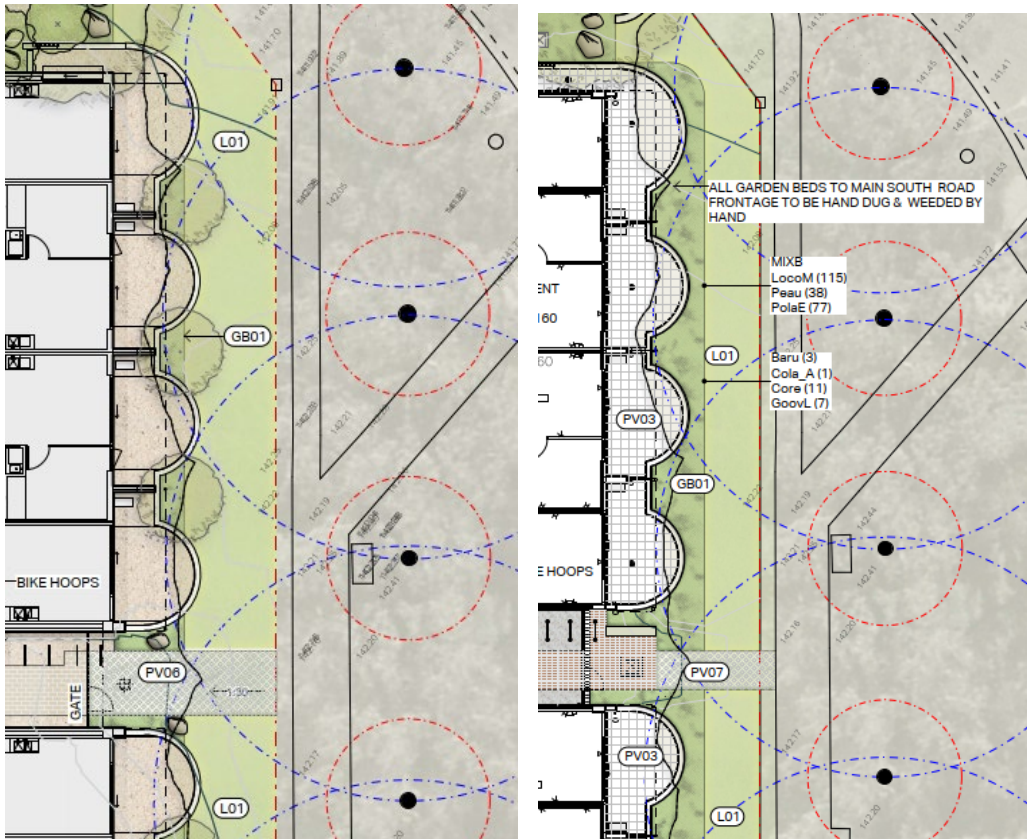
Decision plans (left) and proposed plans (right) showing changes to Main South Road interface.
